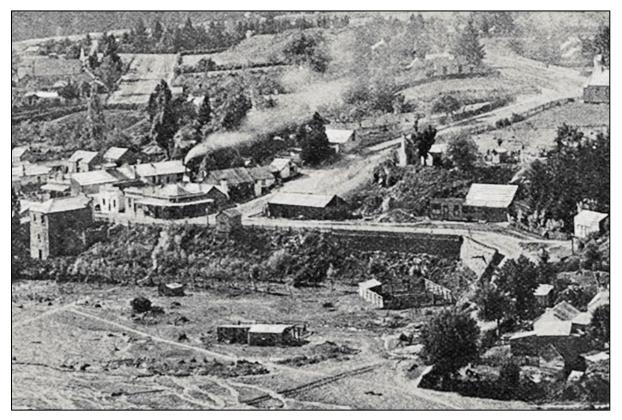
Butler's Green wall, circa 1890s, showing the height of the parapet above road level.²⁷
